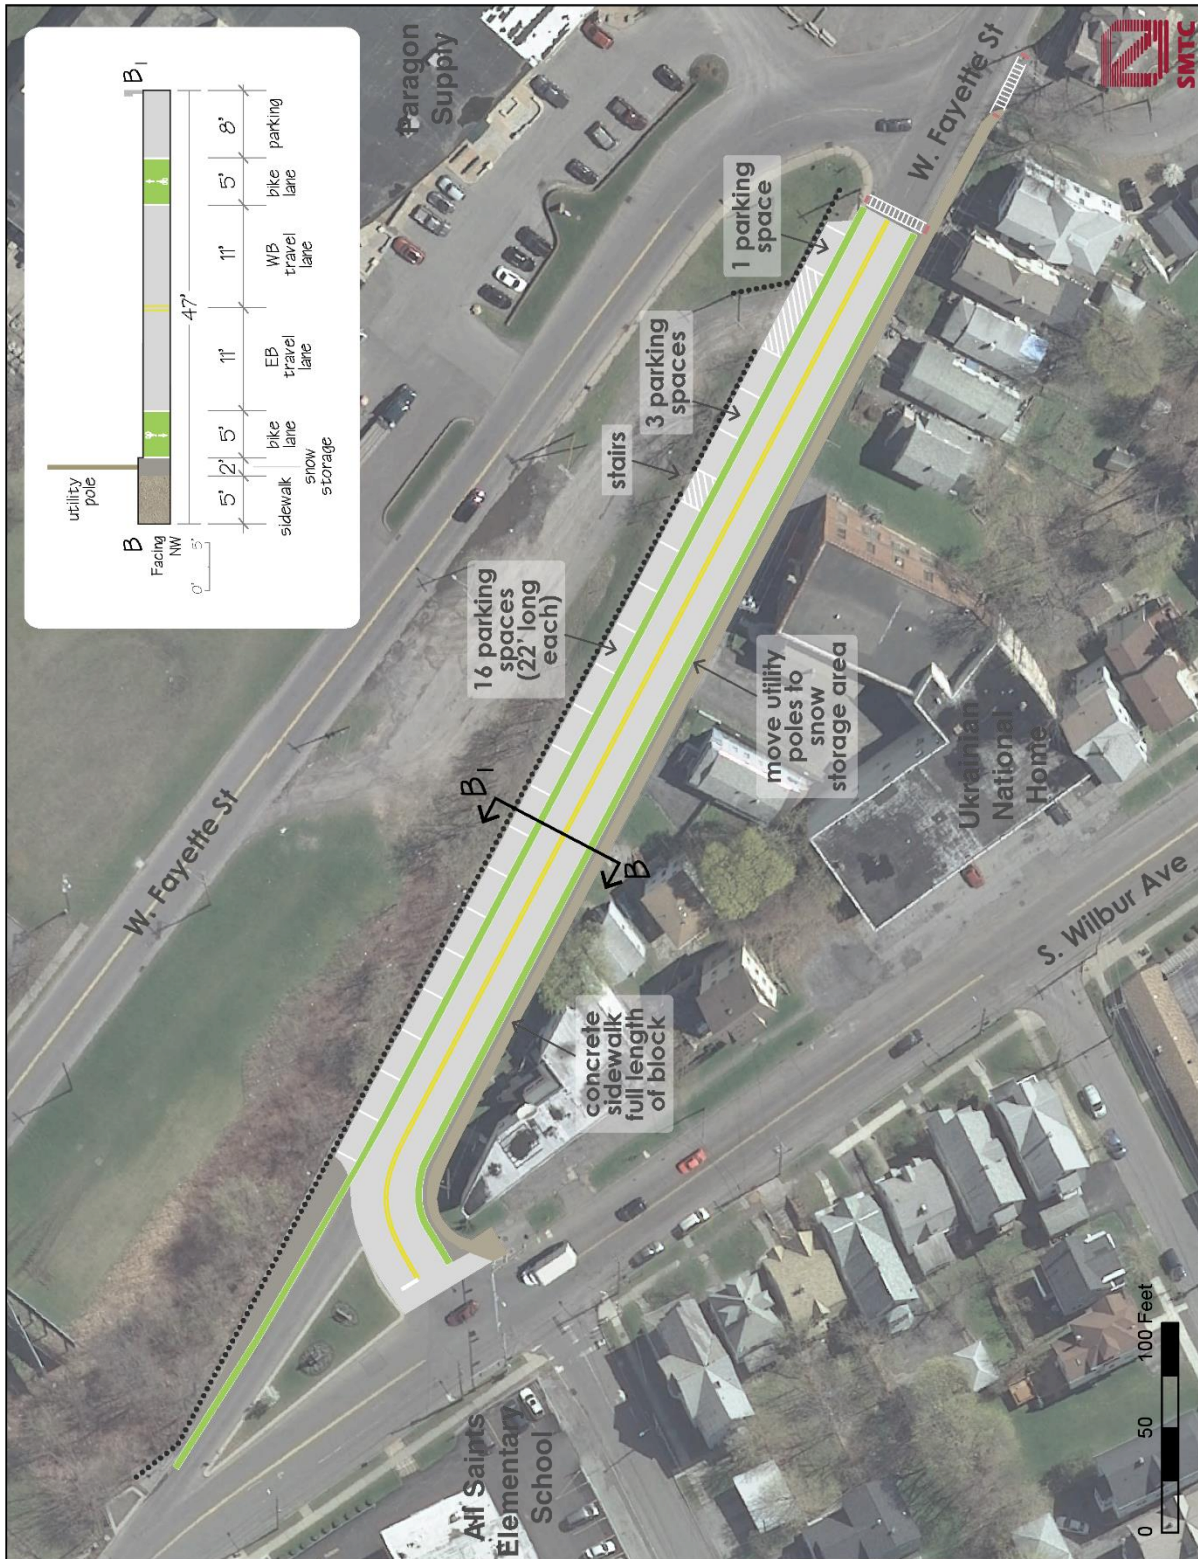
Concept 2 Fayette Street (South Wilbur Avenue to Nelson Street)
